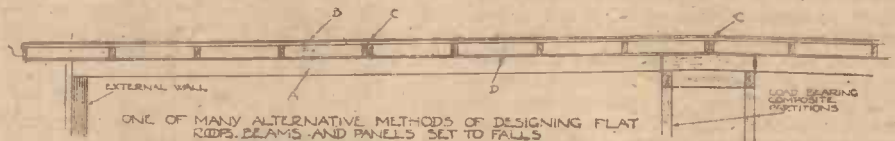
FLAT ROOF WITH BEAMS AND PANELLED UNITS SET OUT OF LEVEL TO PROVIDE FALLS TO ROOF. A—Beam. B—Roofing, etc. C—Small section roof joists. D—Ceiling lining.
